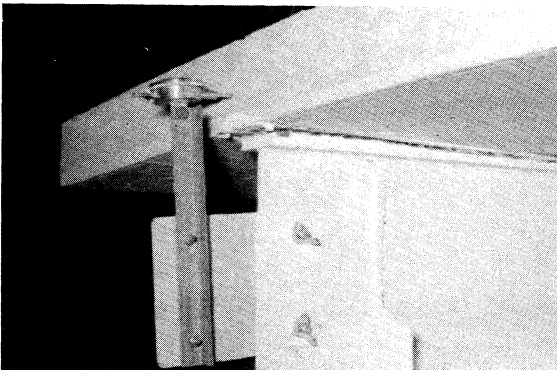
Beam 14b at failure. Note the large slip between the steel flange and the concrete slab. Also the separation between steel and concrete can be clearly seen.
